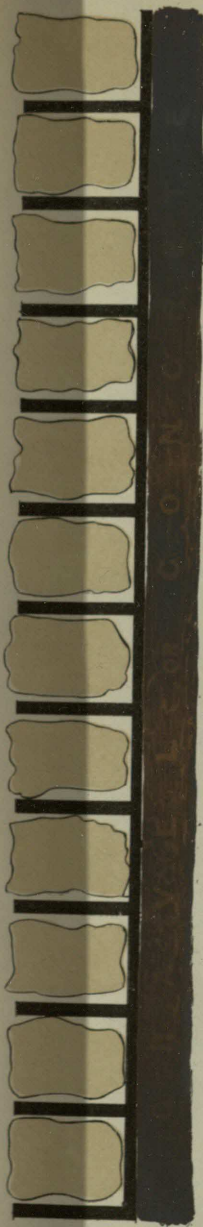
represents the areal or working surface of the pavement for ordinary streets or roads, showing the position of the cast-iron vertical girder division plates, and the granite or wooden blocks as packed and concreted therein.
